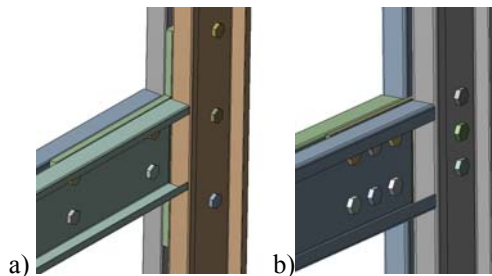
Cold-formed steel joint under analysis with a) T form gusset plate and b) rectangular form gusset plate
